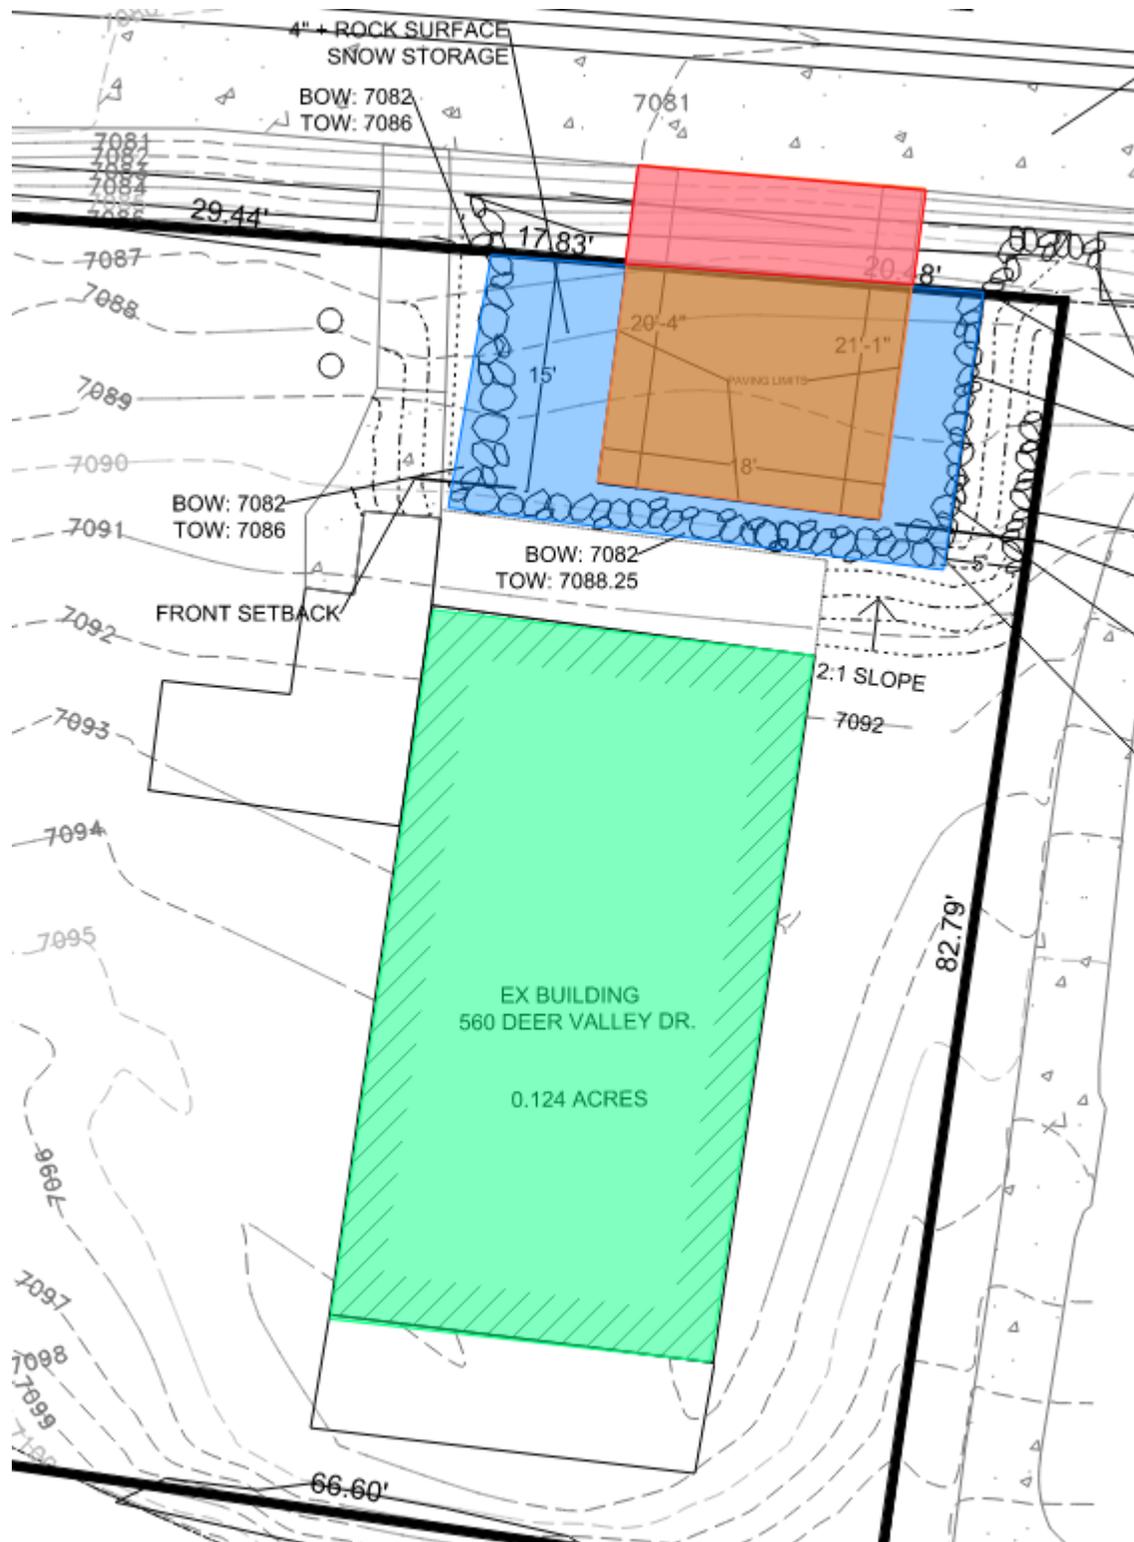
Proposed site plan submitted by Applicant, Staff has shaded the Historic Structure in green, the disturbed area in blue, the paved Parking Area in orange and the area that encroaches into City Right of Way in pink.
